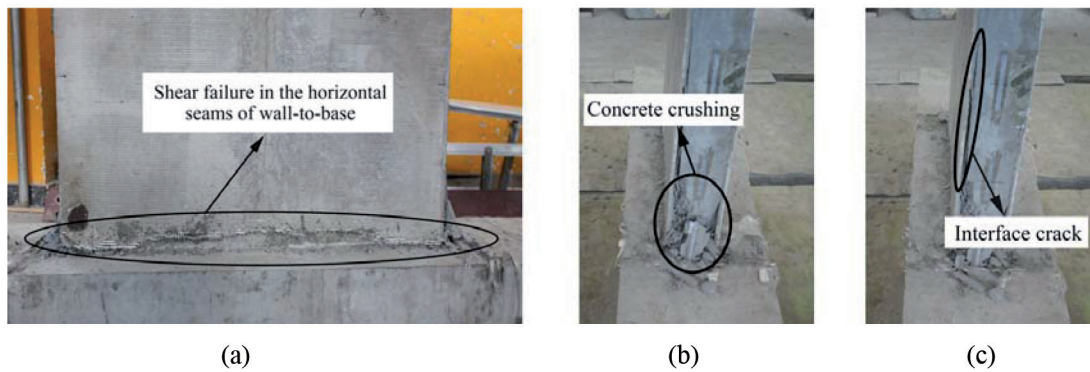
Final failure modes of typical specimen. (a) Shear failure, (b) Crushing, (c) Interface crack
